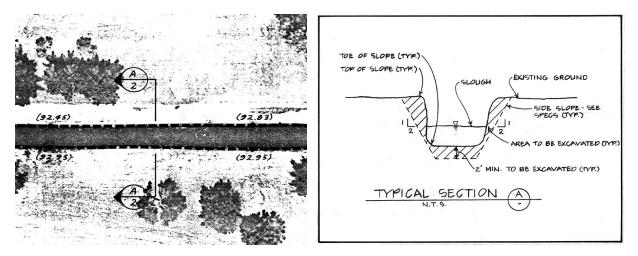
Typical East Slough Bankline Elevation Callouts (Left) and Dredging Detail (Right)
